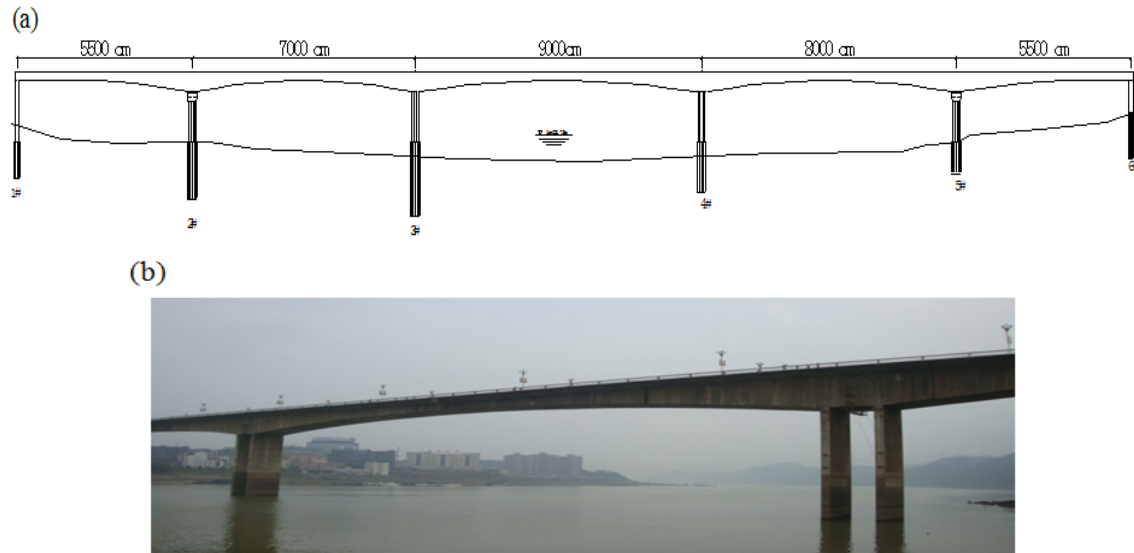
The tested bridge: (a) Configuration of the bridge and (b) Longest span of tested bridge
